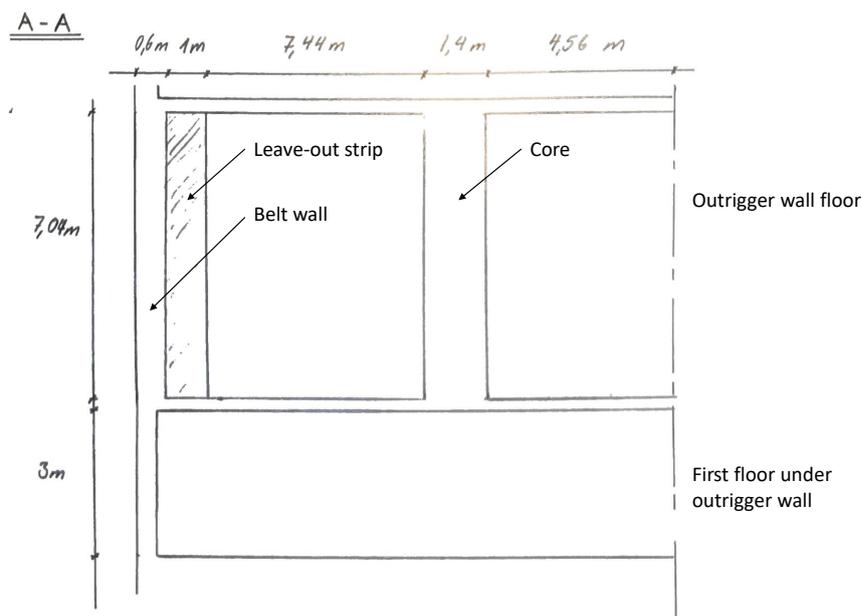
Simple sketch of the outrigger wall floor elevation.
